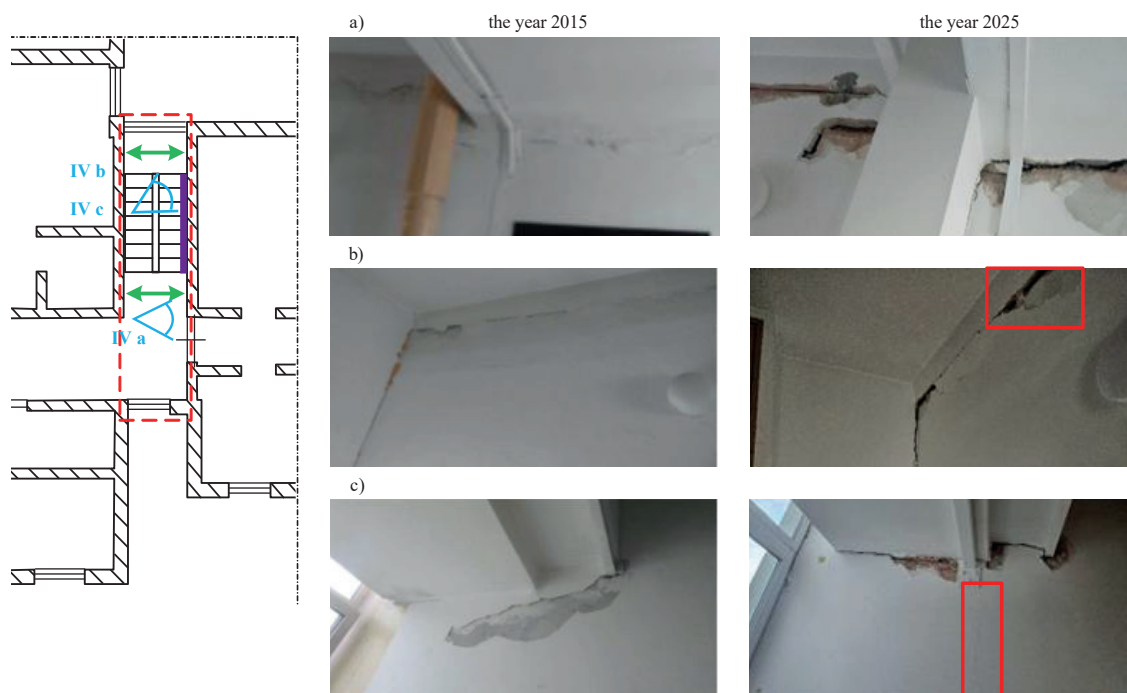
Extent of damage on the top floor in 2015 [16] and currently: a) cracks above the entrance to apartment no. 18; b) cracks at the junction of the staircase and the longer part of the building; c) landing support point
